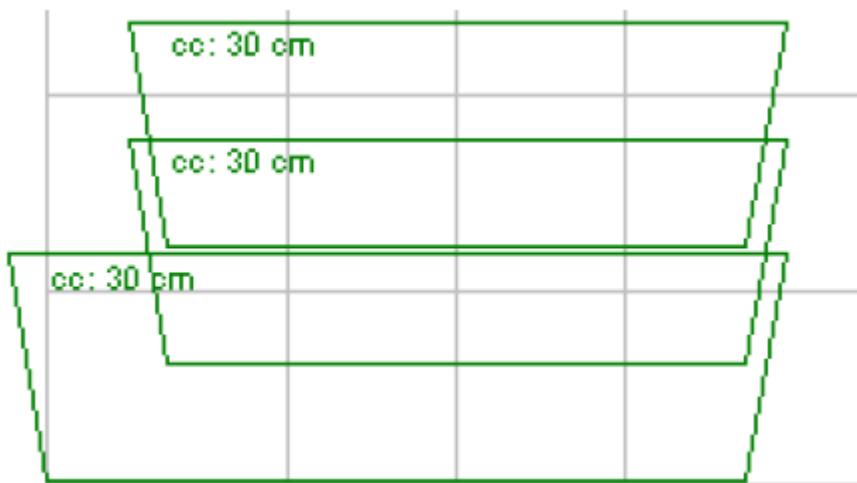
Spiling bolts shown in a schema in unfolded perspective in Novapoint Tunnel
